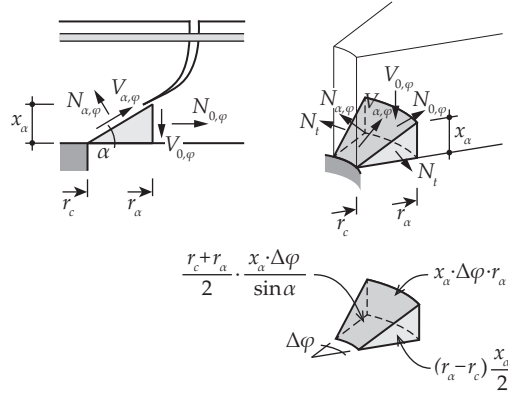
Forces acting on a sector of an element in the compression strut (positive directions are shown)
